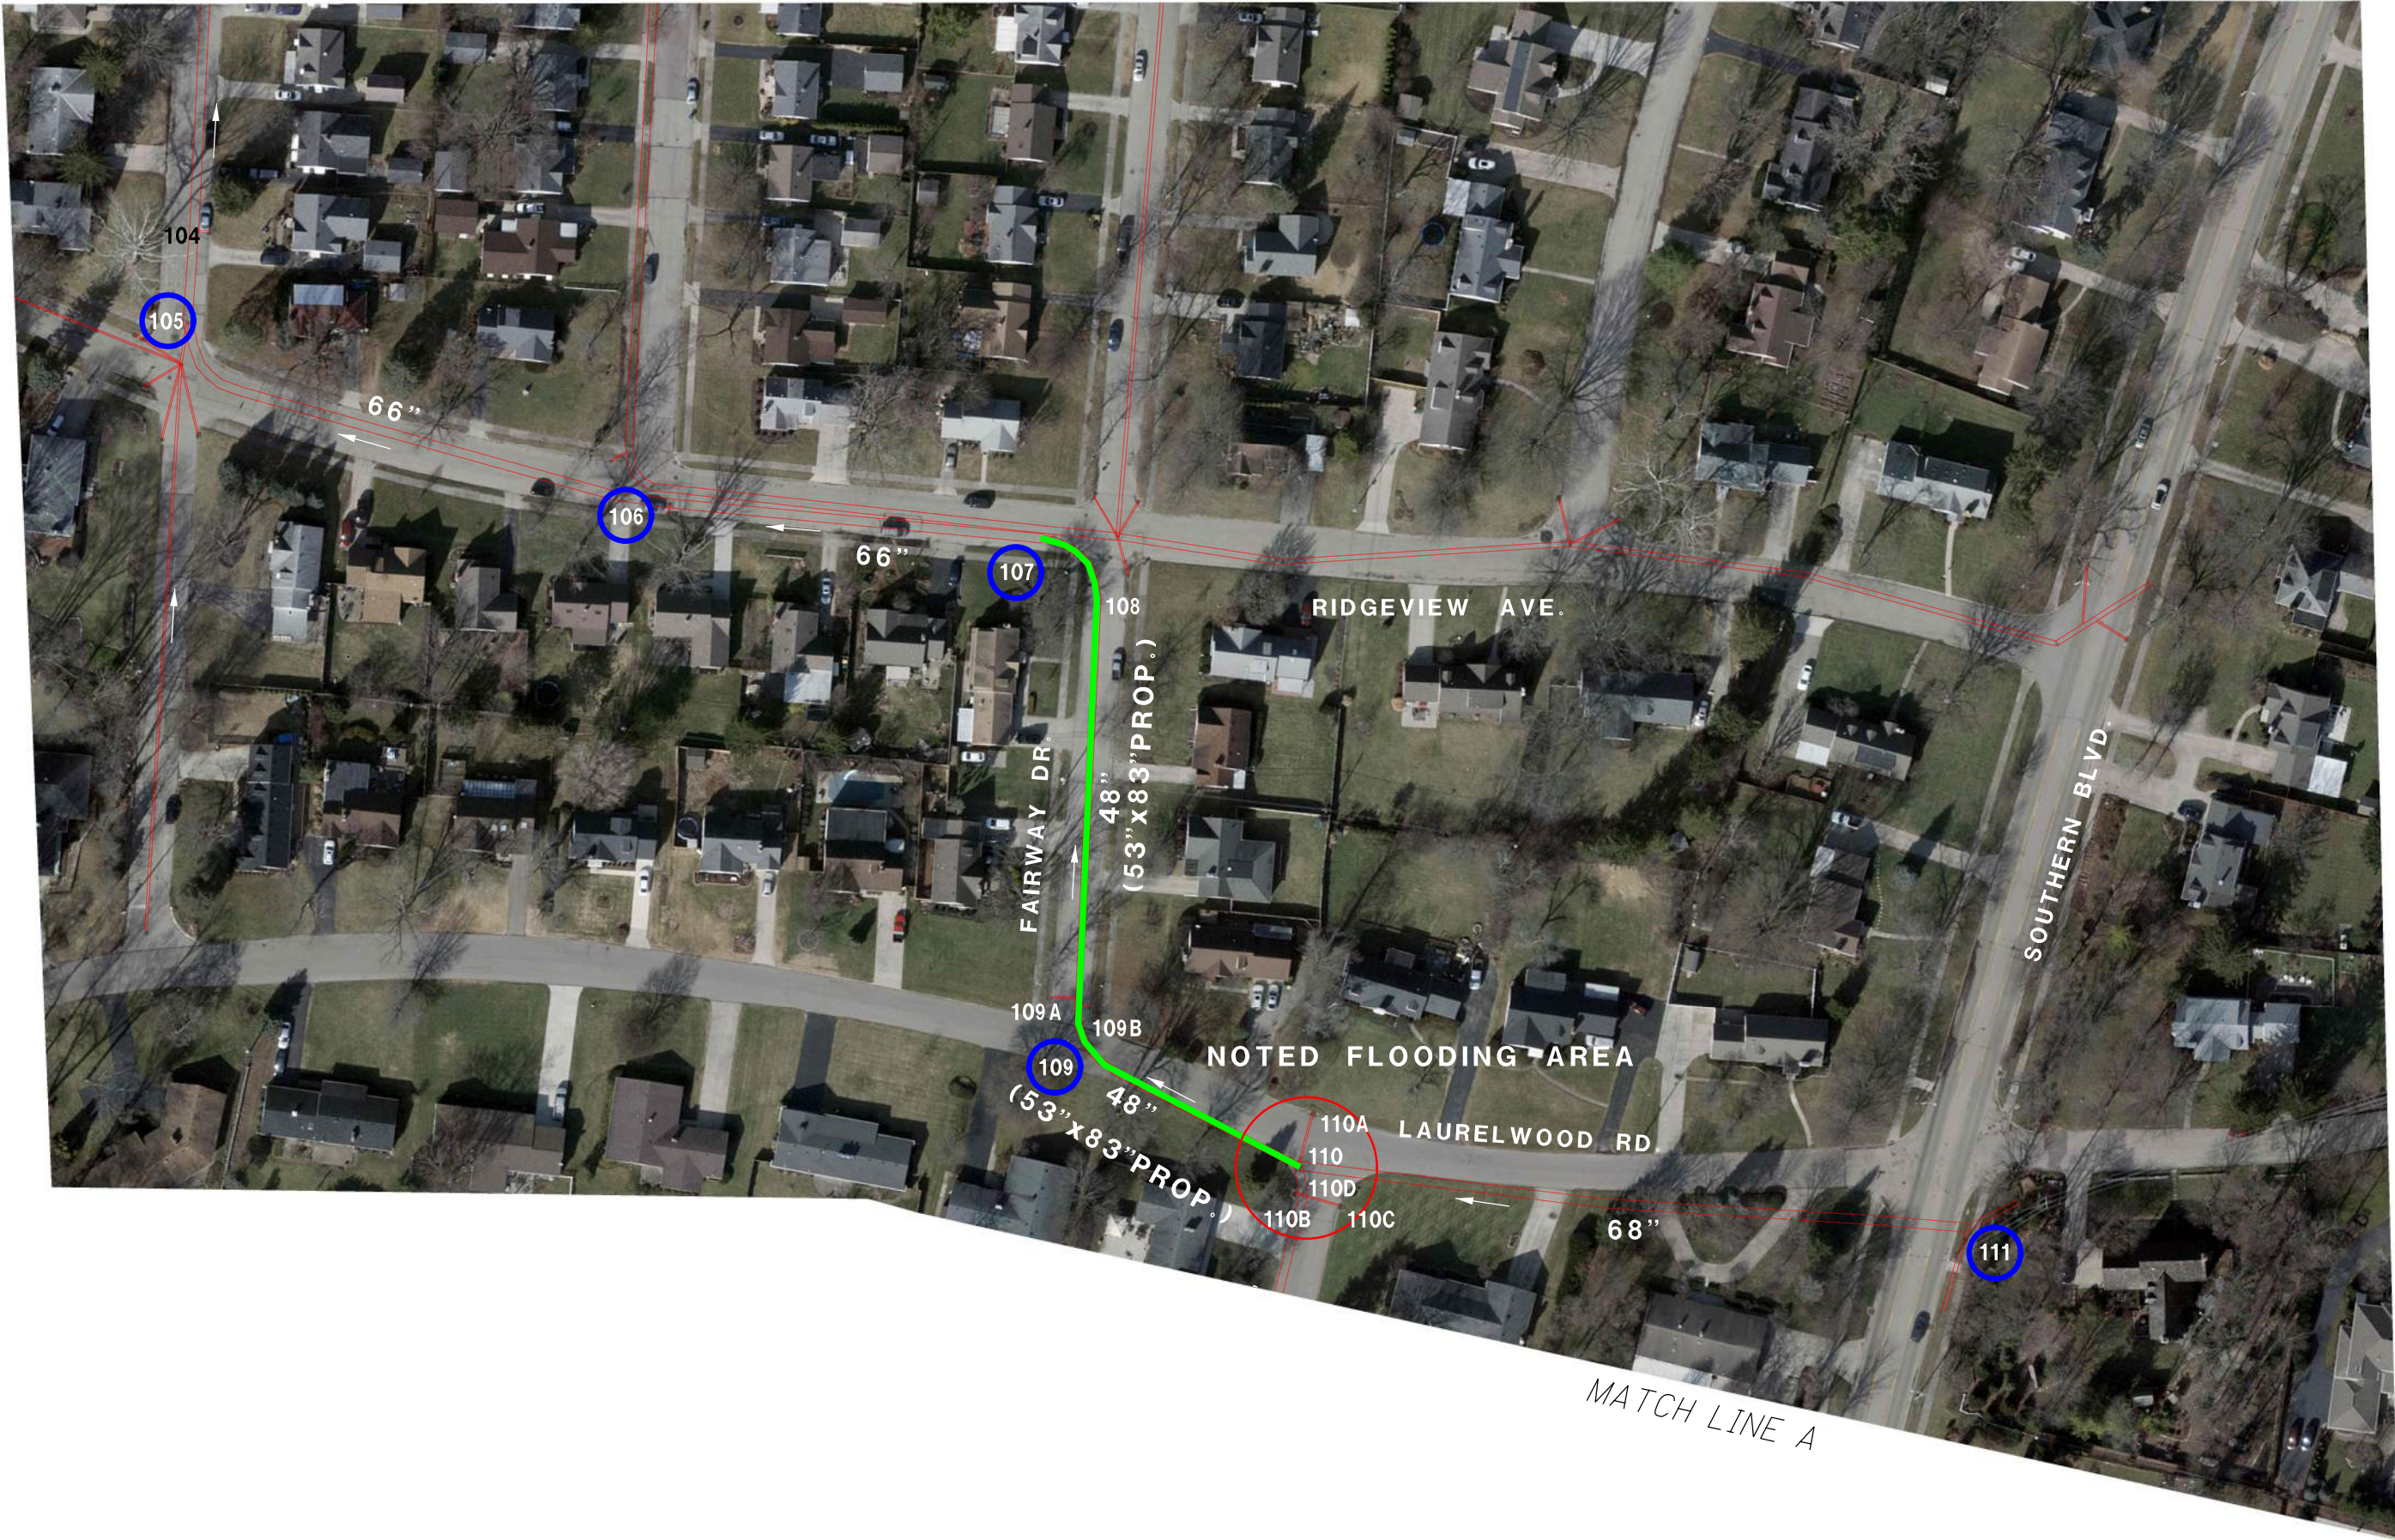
ALTERNATIVE 3, PLAN 2/3
